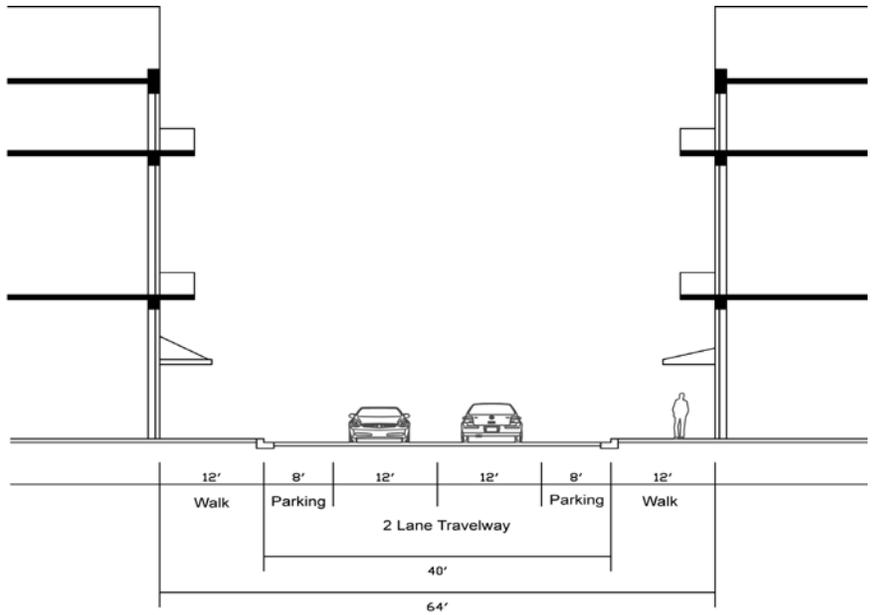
Mixed Use Town Center connector roadway cross-section
